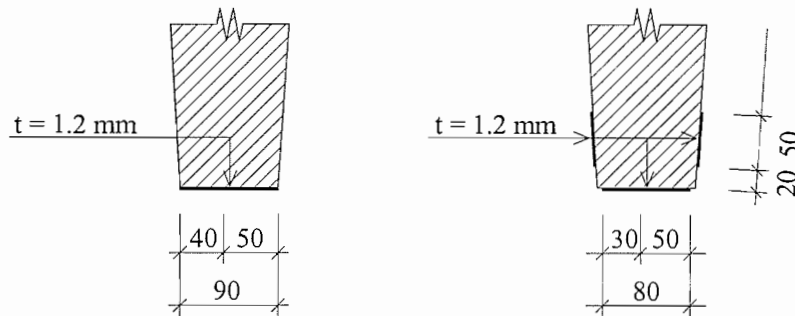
Arrangement of the CFRP plates (beam no.3 and no.4)
